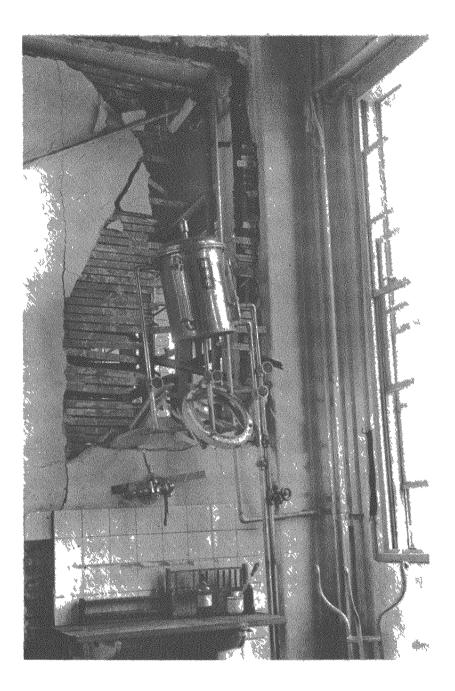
(3H). Red Cross Hospital (1600 meters). Damage to sterilizing equipment. (Photo File # HH 237.)
